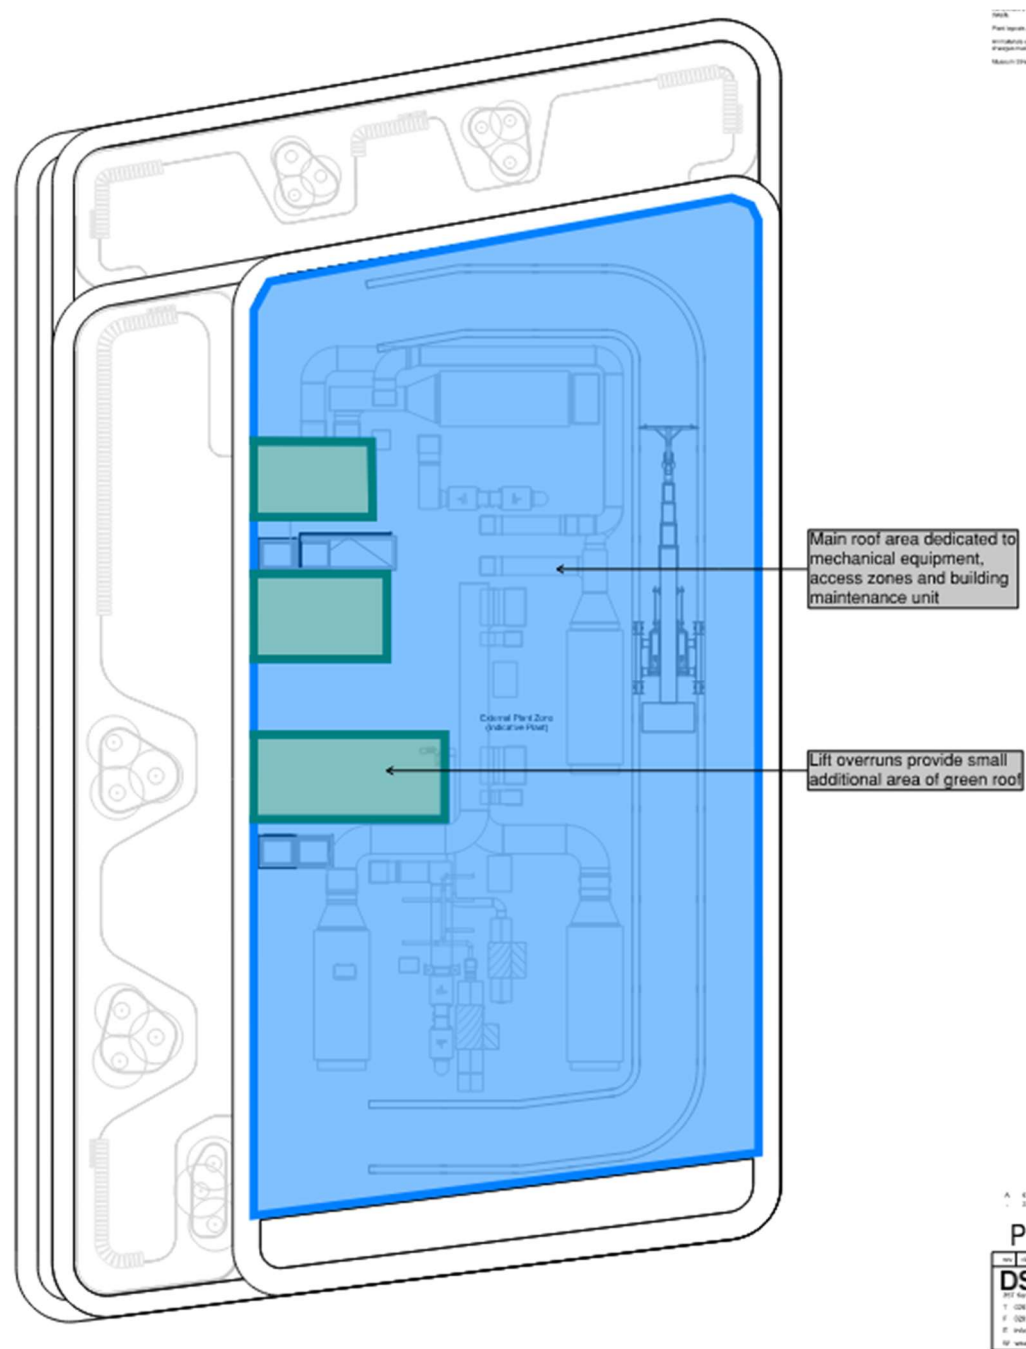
1 Museum Street roof, allocated to mechanical equipment
